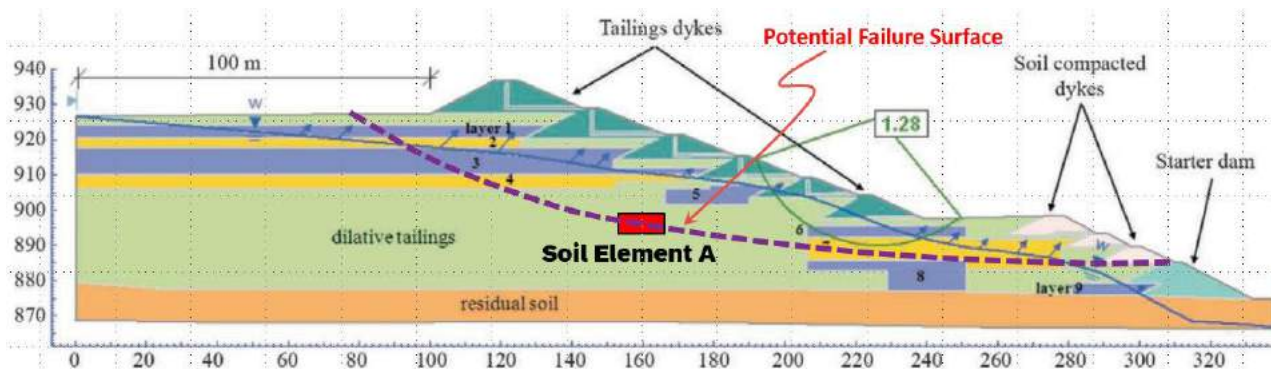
Soil Element A located at The Potential Failure Surface of a Typical Upstream Construction Tailings Dam.
